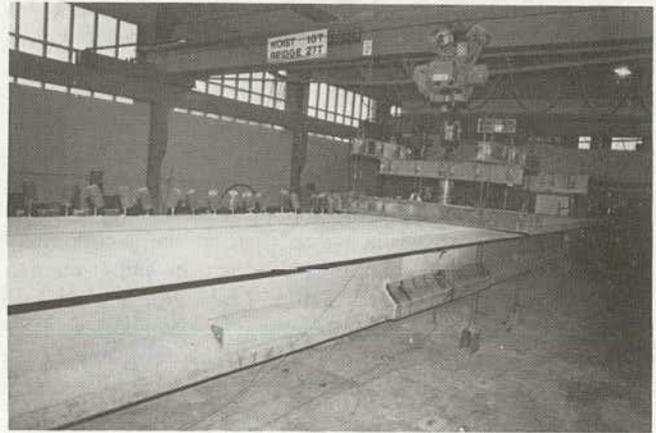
(b). Girder during load tests—girder prior to sleeve splice load test 9.
